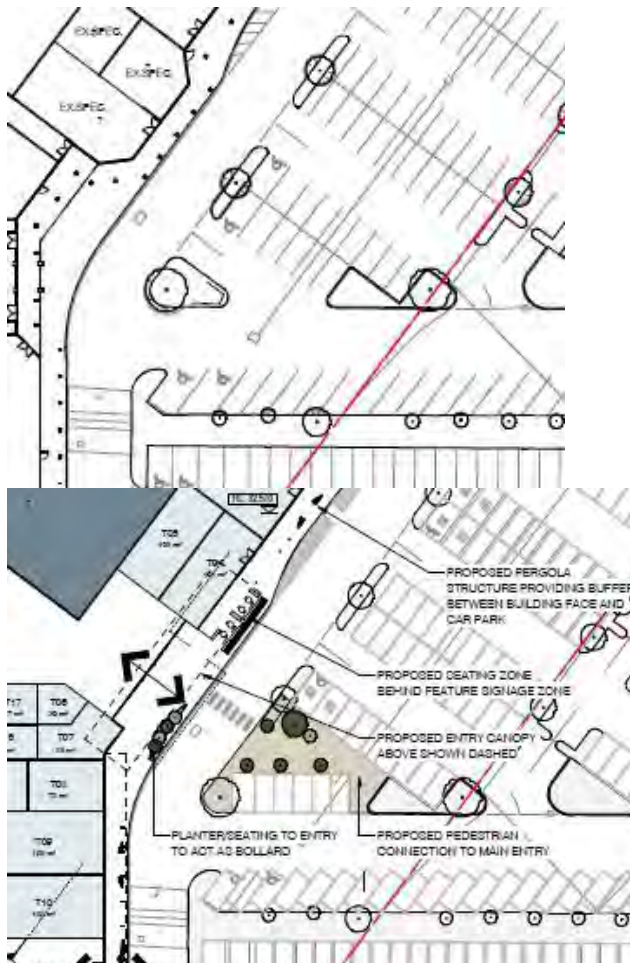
Car parking and traffic island to be resigned (existing and proposed)
